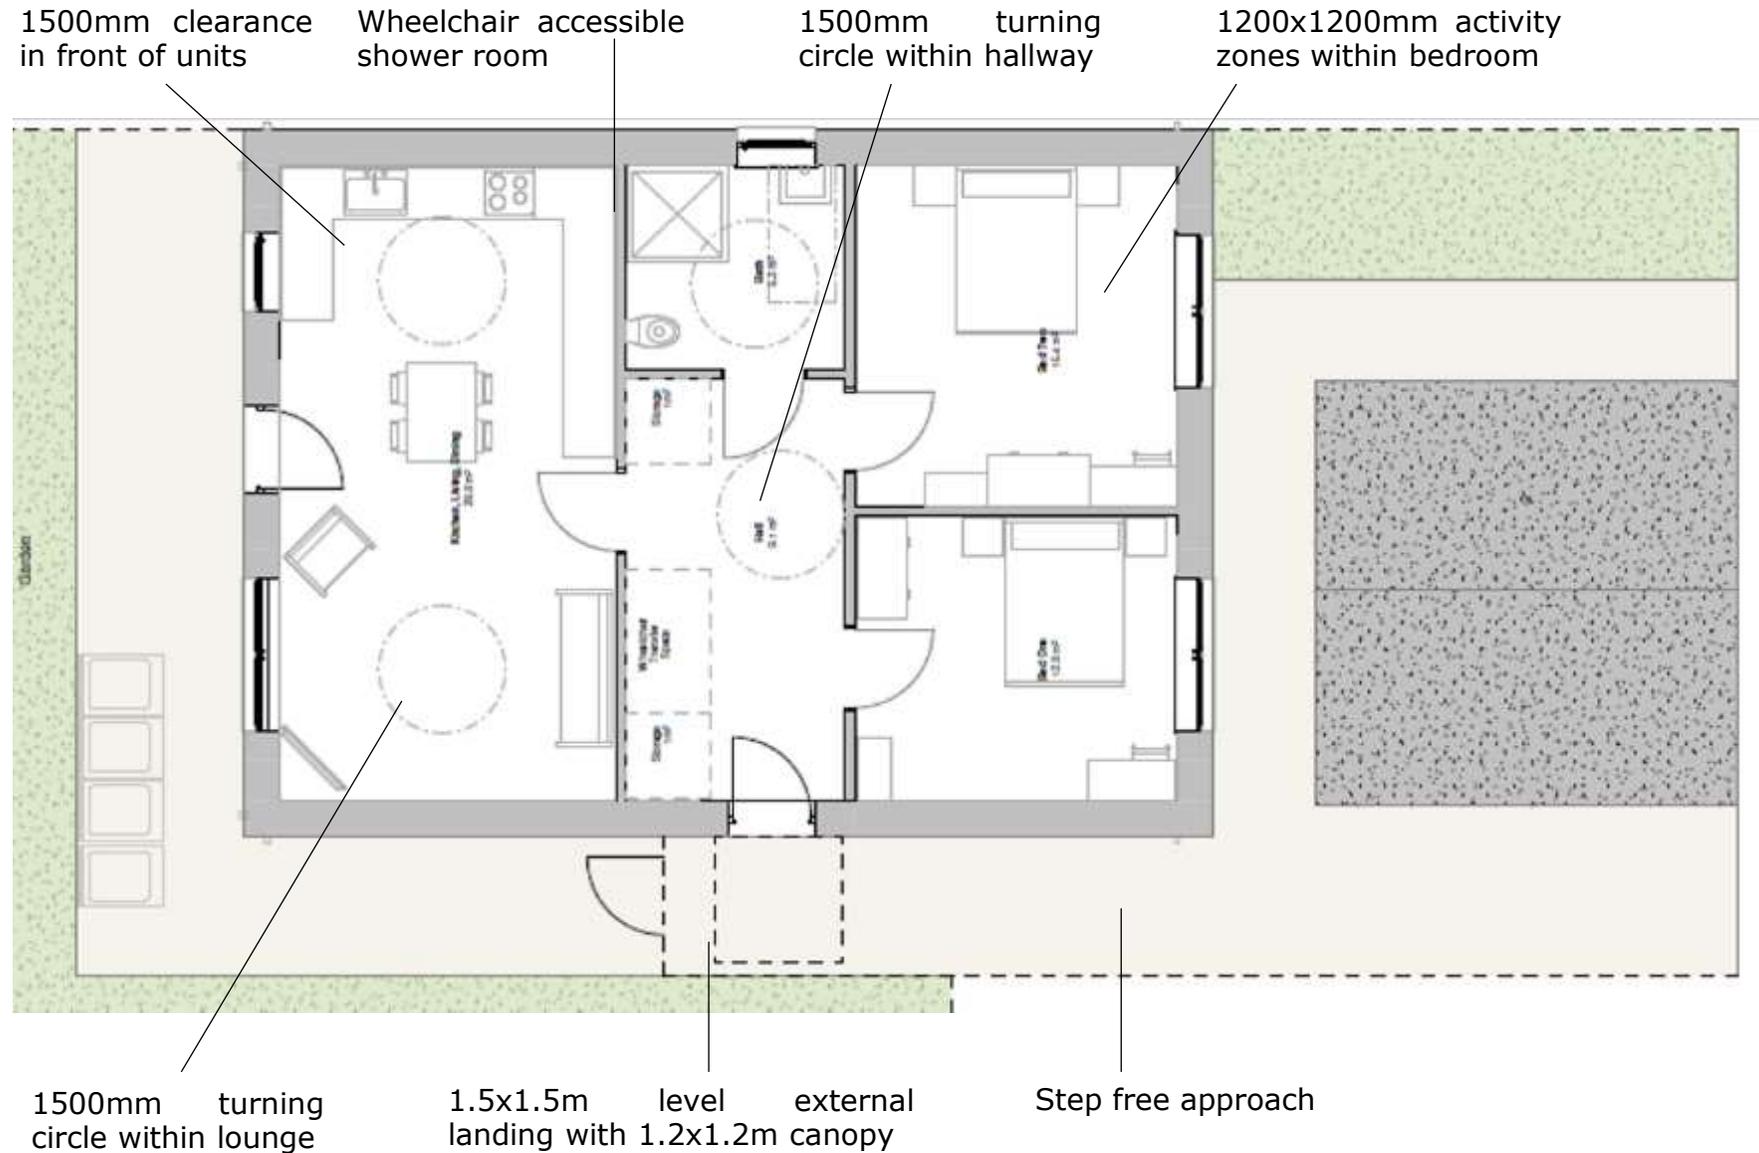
Typical Bungalow Layout to M4(3) Standard
